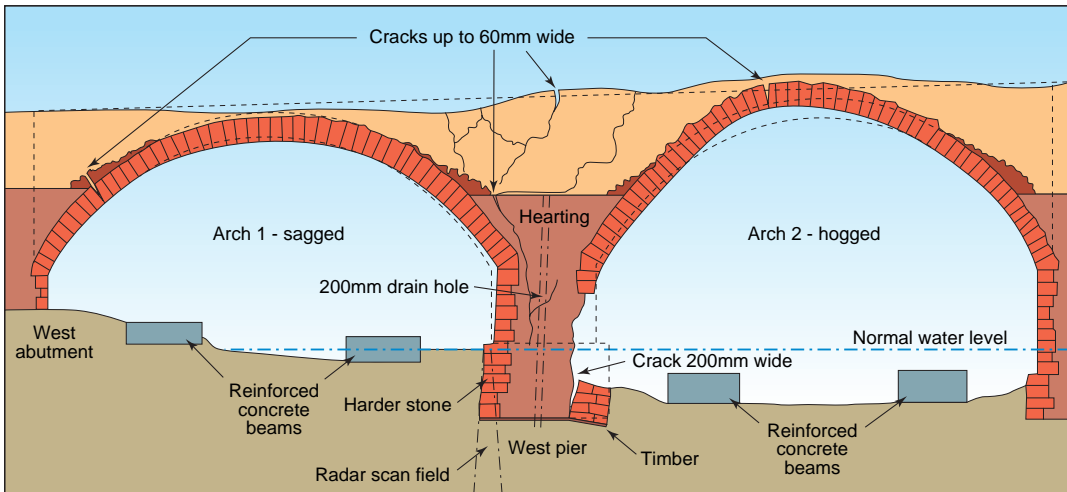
Section of west pier and adjoining arches with spandrel fill removed—looking north
